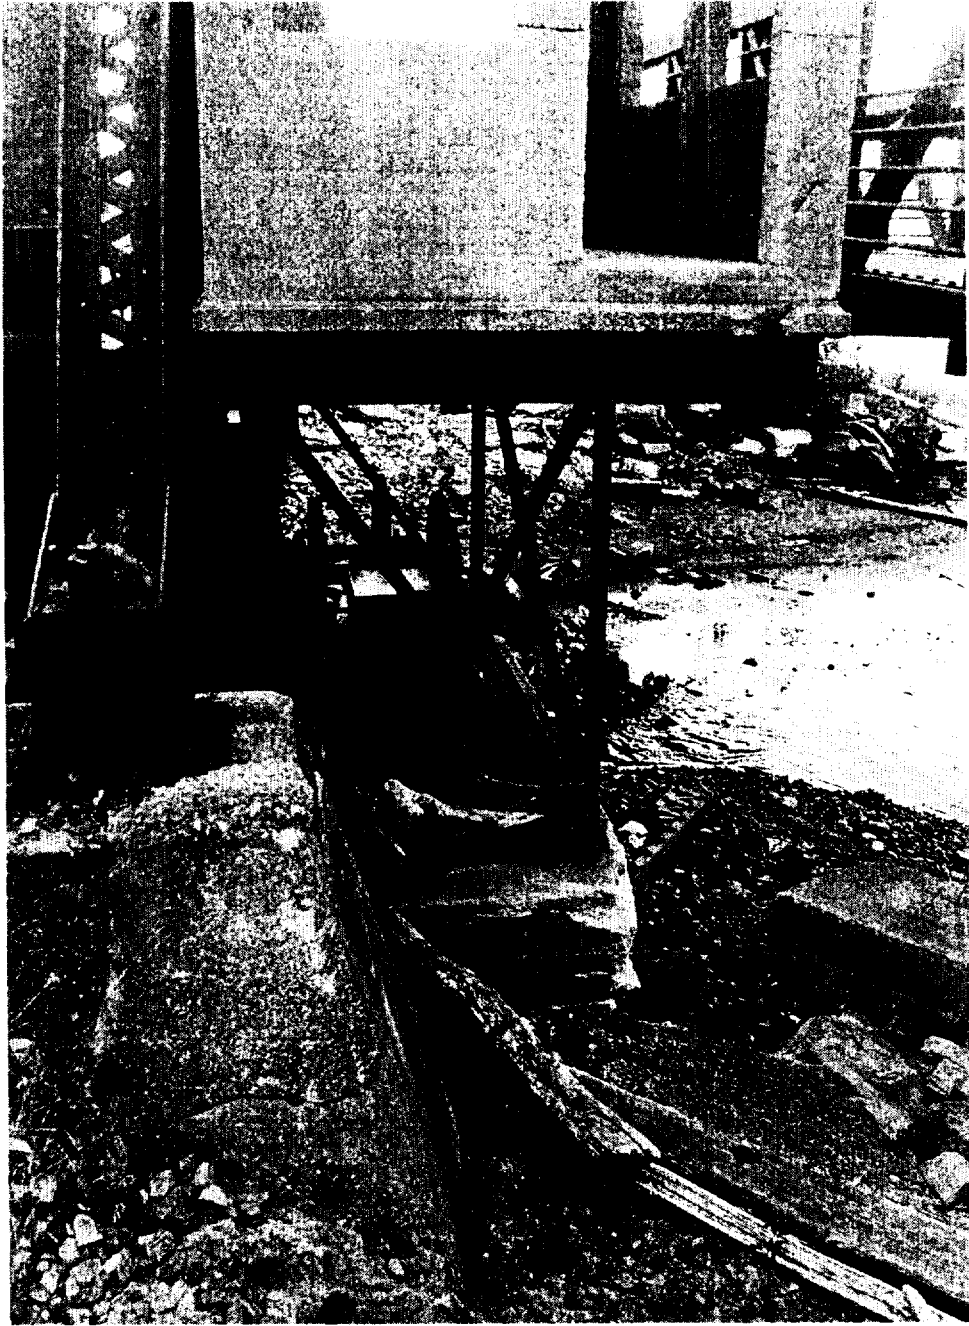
Machinery platform of bridge. Note steel framework anchored in concrete footing at left, operator's house in upper center, and remains of steelwork to right of machinery platform. View to south.
